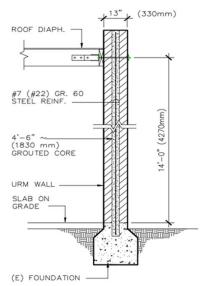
Typical wall cross-section: core-grouted steel rod spanning the wall thickness (green), embedded steel moment frame around the opening (gray), plywood diaphragm overlay, and steel strap anchorage tying diaphragm to wall top
